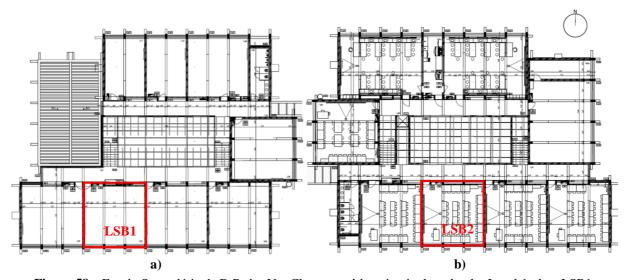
Escola Secundária de D.Pedro V – Classrooms' location in the school – Level 1 plan. LSB1 (building A2), a); LSB2 (building A3), b). [Source: Parque Escolar, EPE (2012)]
